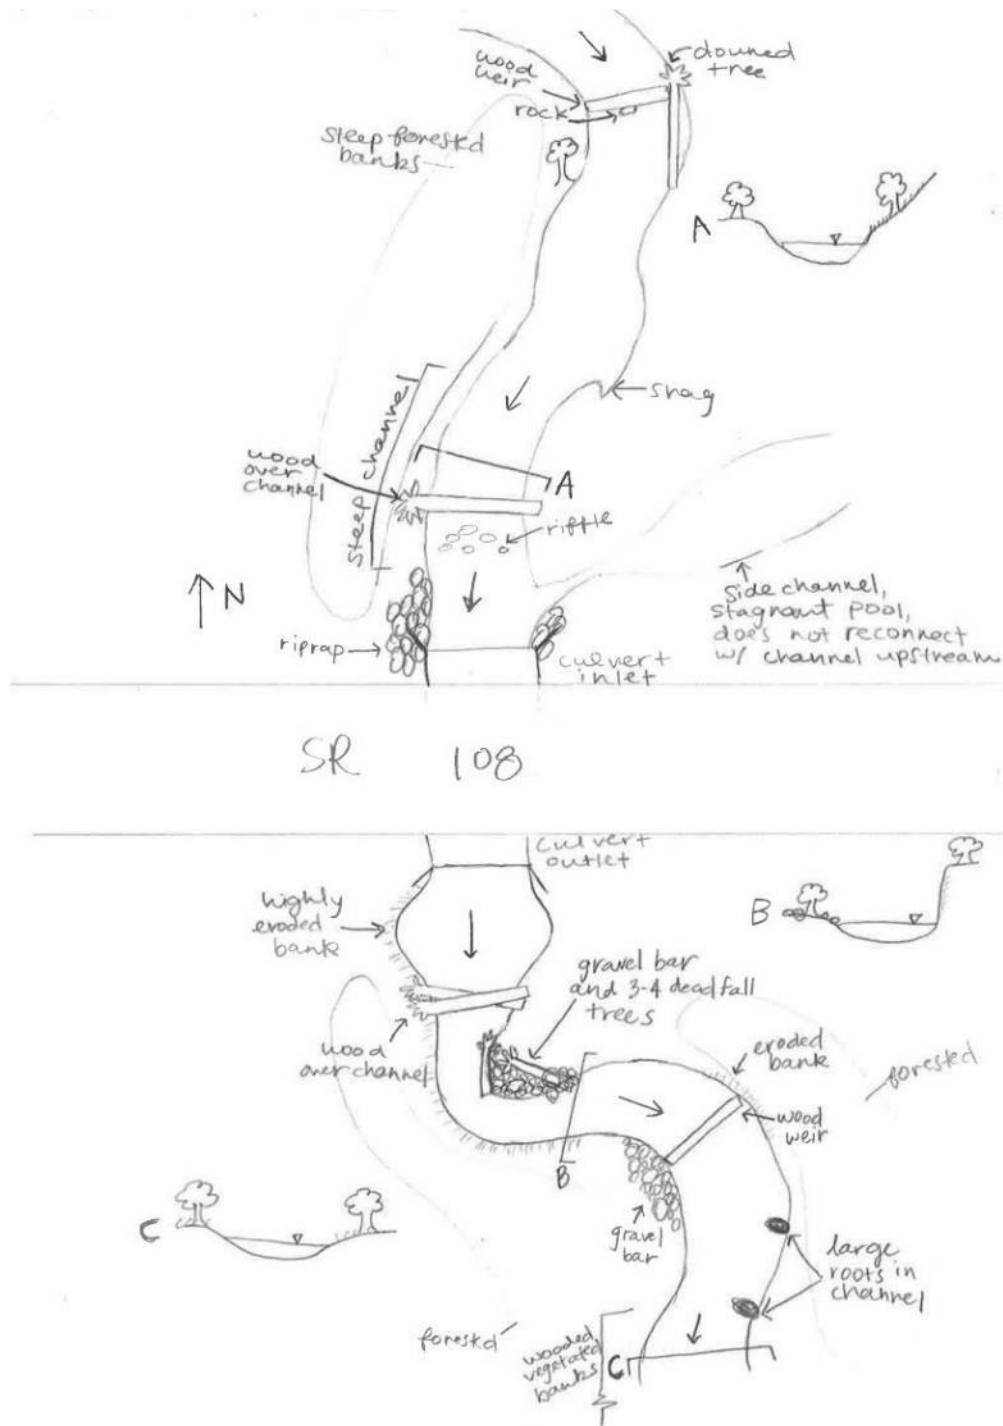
Plan view and cross sections of upstream and downstream reaches of the crossing (not to scale)
